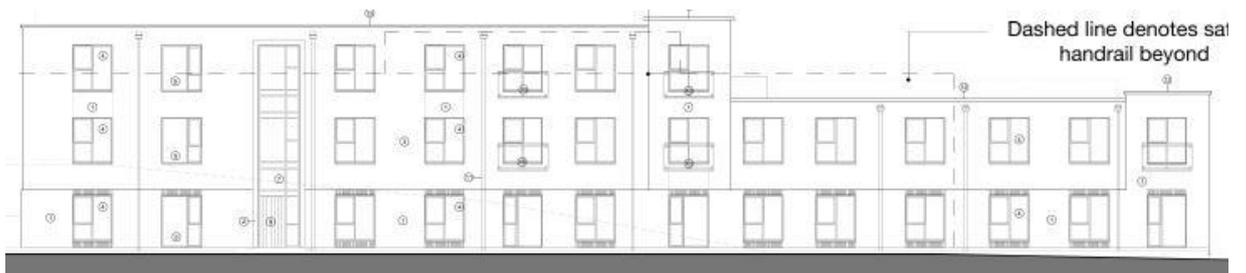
Proposed front elevation facing north east towards the proposed parking area.
